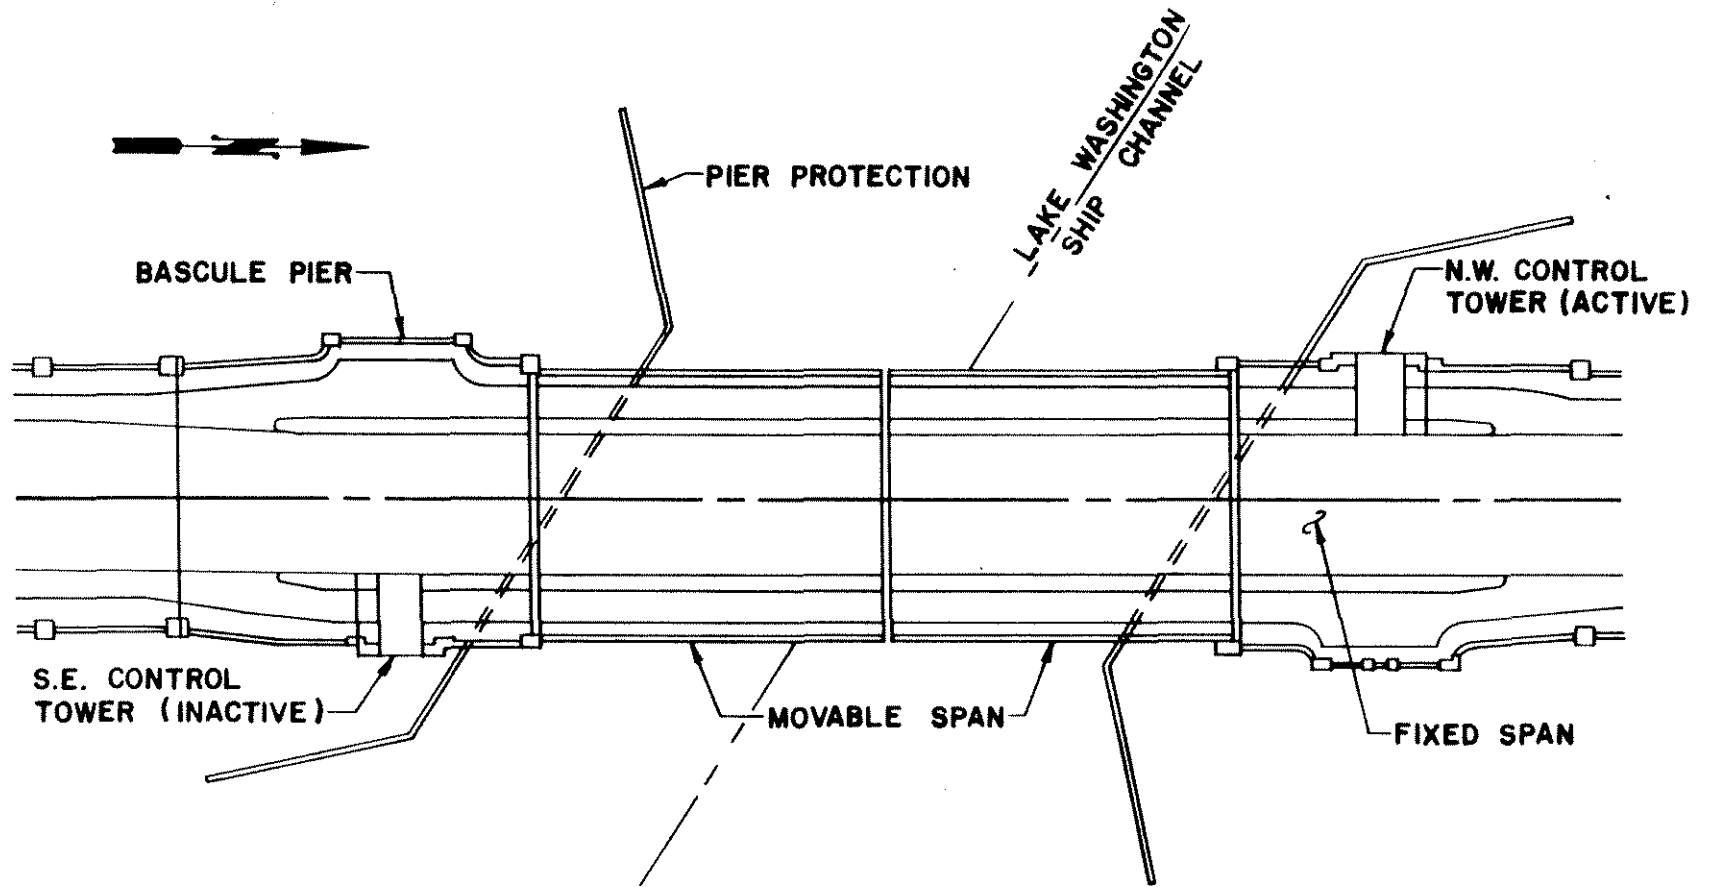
PLAN UNIVERSITY BRIDGE
